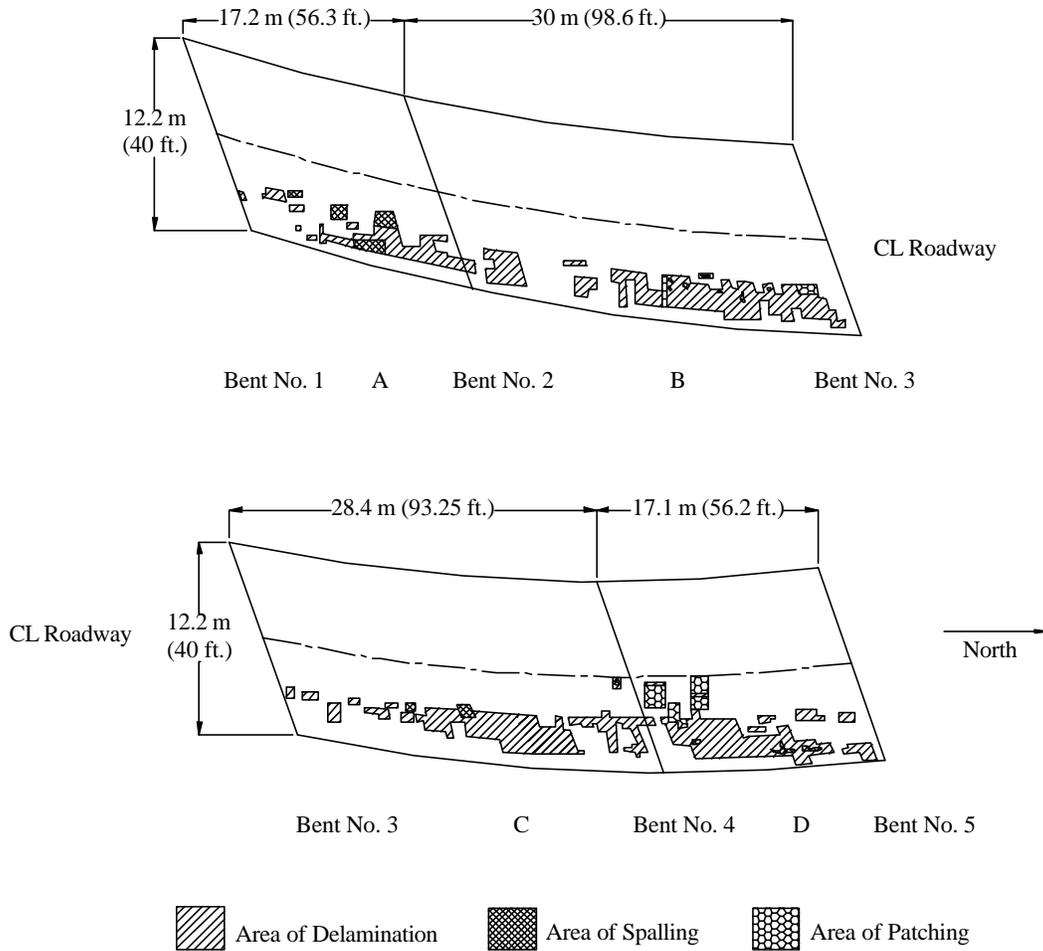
Delaminations, Spalls, and Patching Found on Structure #37-47-5980
